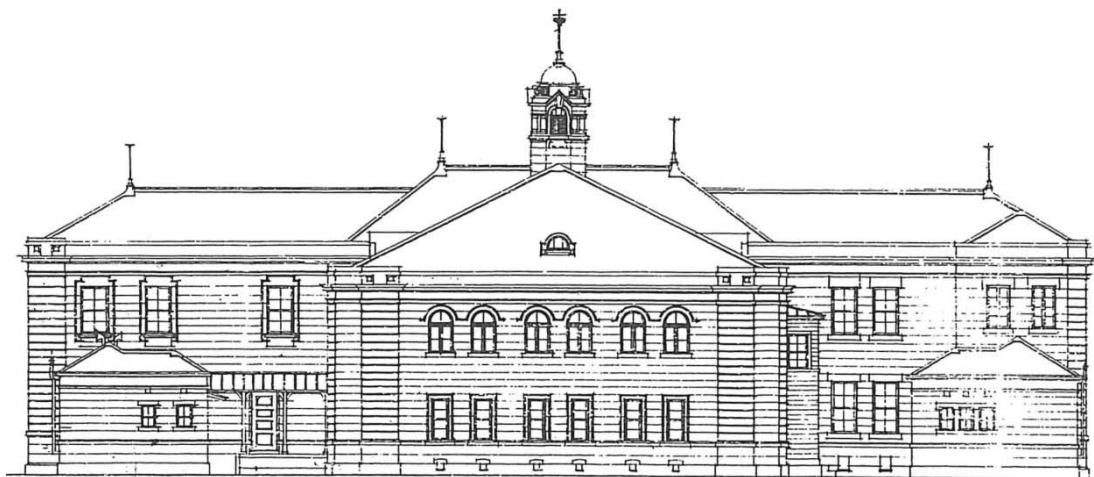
Elevation of north side in 1916, when the Assembly Building was constructed (back side)
